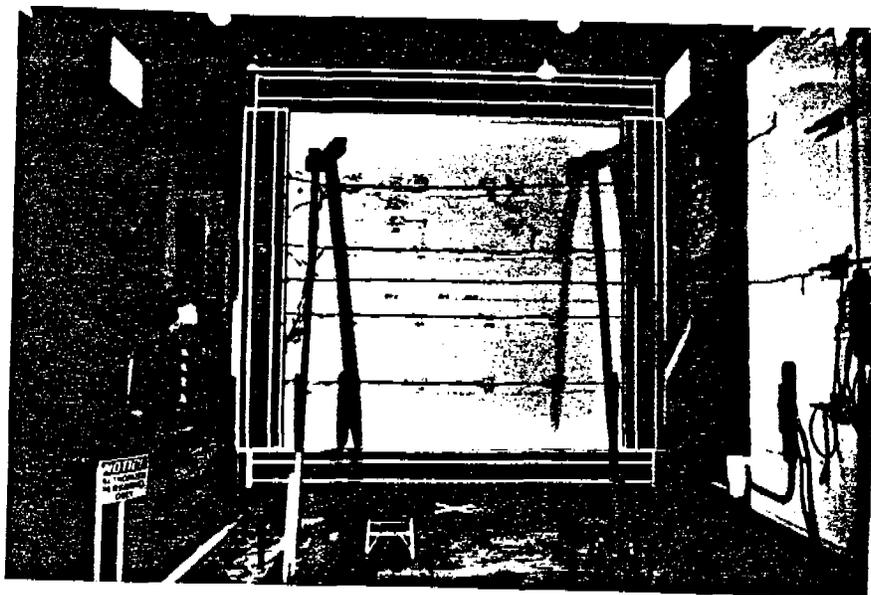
Outdoor Surface of Wall P1 Before Calibrated Hot Box Testing
